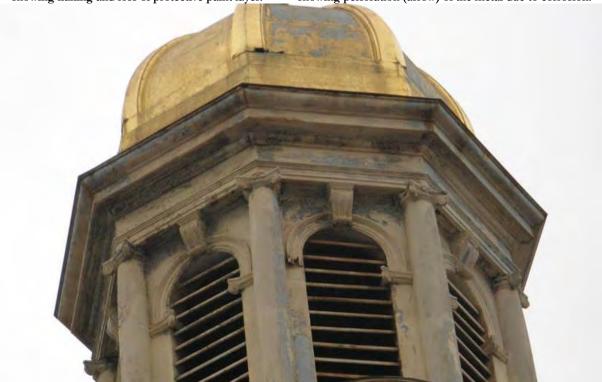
East tower detail, constructed entirely of pressed sheet metal, showing missing architectural detail, loss of gilding and protective paint, and corrosion stains.
